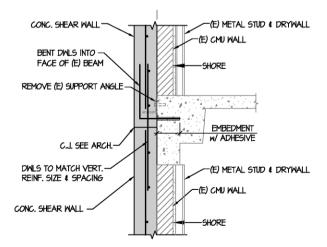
New Concrete Shear Wall Attachment to Existing Concrete Spandrel Beam
